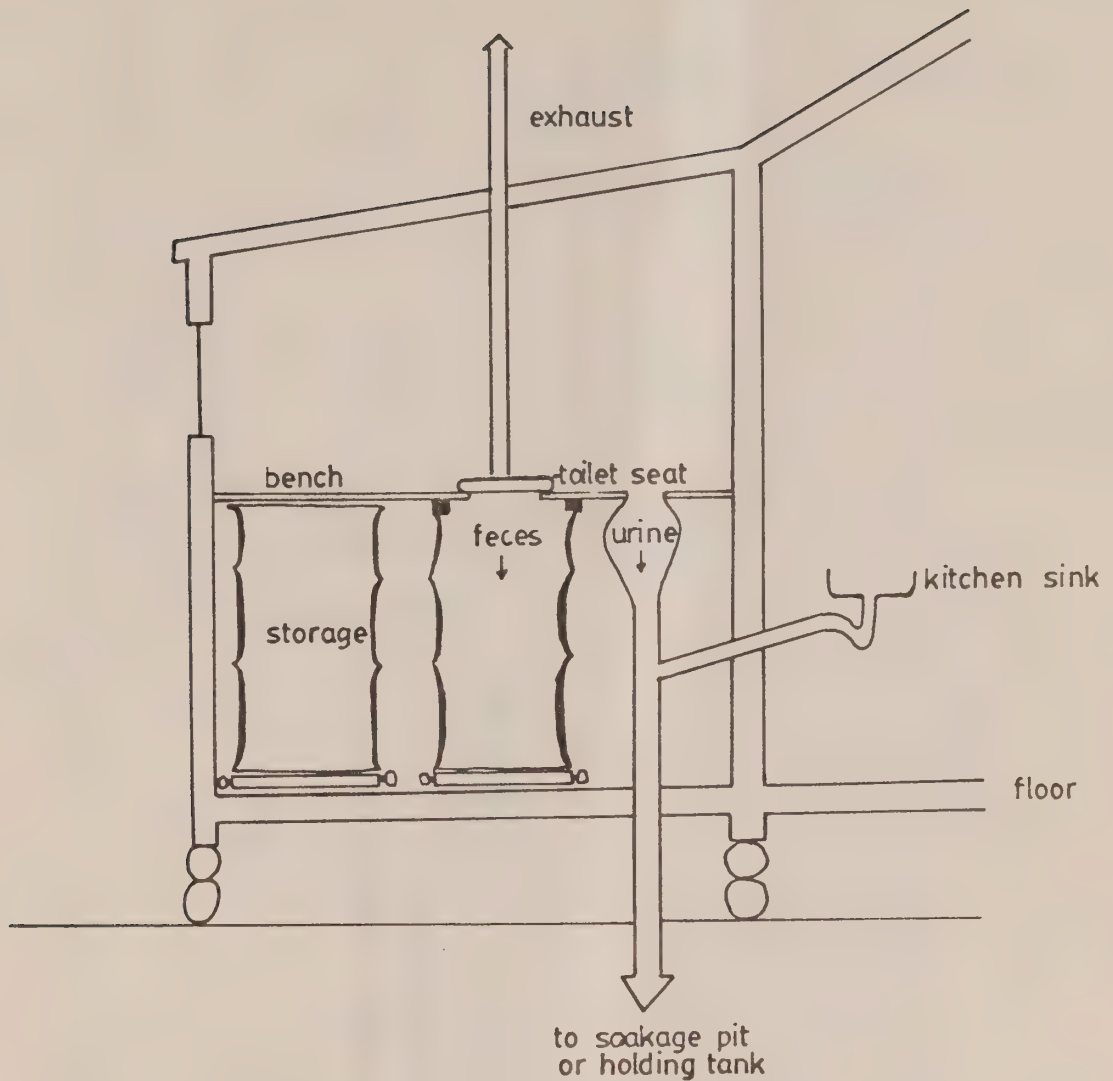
Front section of toilet area added onto existing house. Drums sit in wooden compartment. Top of the compartment functions as a bench.
